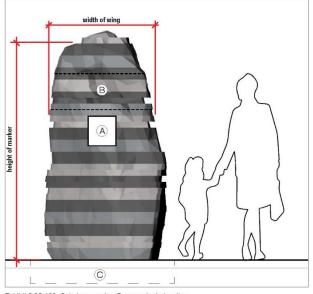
Cut stone marker A conceptual elevation
